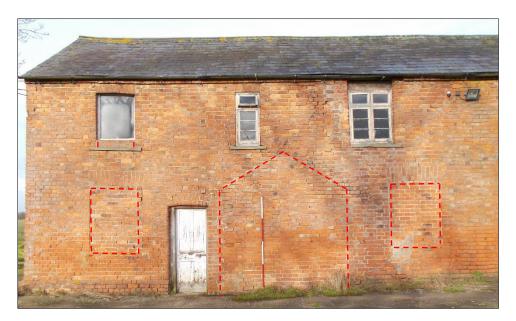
The farmhouse showing scar of former single-storey range, infilled ground-floor windows and reduced first-floor window (red dashed lines), looking west. Note stone sills to first-floor windows. 2m scale rod.
